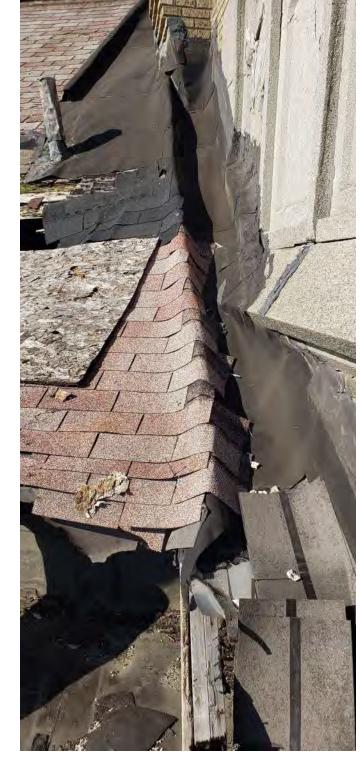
IMPROPER FLASHING AND PATCHING AT THE VALLEY JUNCTION BETWEEN THE POLYGONAL ROOF AND BELL TOWER; THE ASPHALT SHINGLES ARE NOT PROPERLY TERMINATED; EXCESSIVE USE OF ROOFING MASTIC ALONG THE BELL TOWER WALL; DETERIORATED ROOF VENT NEAR THE LARGE HOLE IN THE ROOF.
